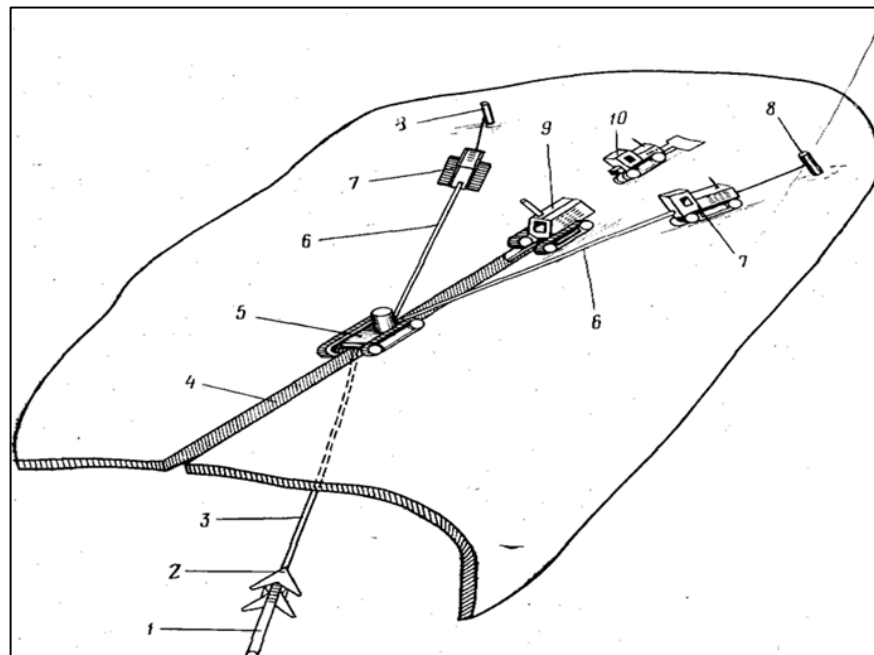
Scheme of Ice-base Pipeline Installation; 1 – pipeline; 2 – trenching plough; 3 – embedded cable rope; 4 – trench; 5 – traction carriage; 6 – cable ropes; 7 – winching tractors; 8 – pipe anchors; 9 – trench excavator; 10 – bulldozer padding fragmented ice [32]
